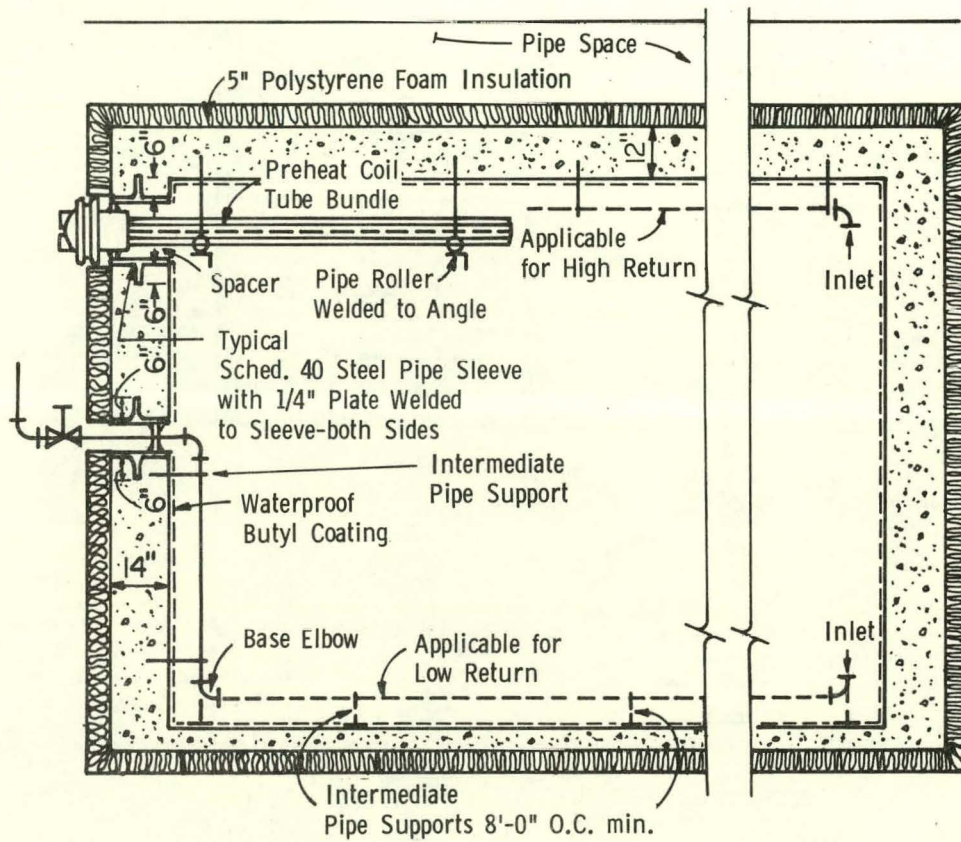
Section through Rectangular Concrete Tank (not to scale)
